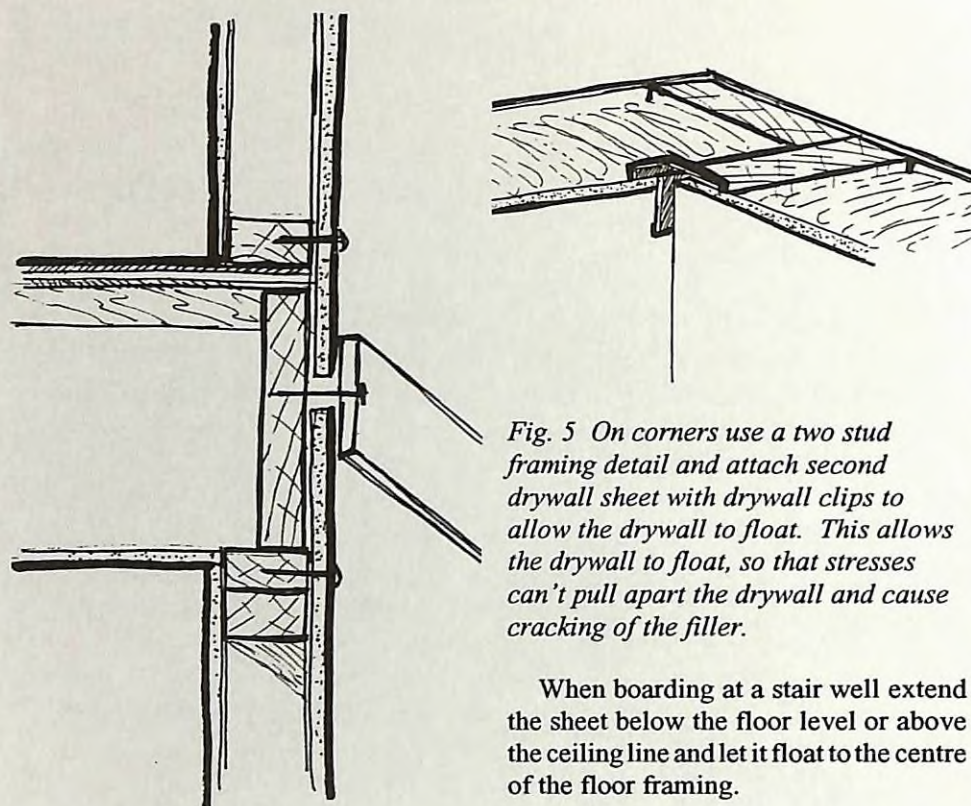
At stairwell wall (or on a two storey wall) allow the drywall to float at the joint. The gap between sheets must be free of filler, don't nail drywall into the floor joist/header, and don't nail the cover strip into the drywall.
